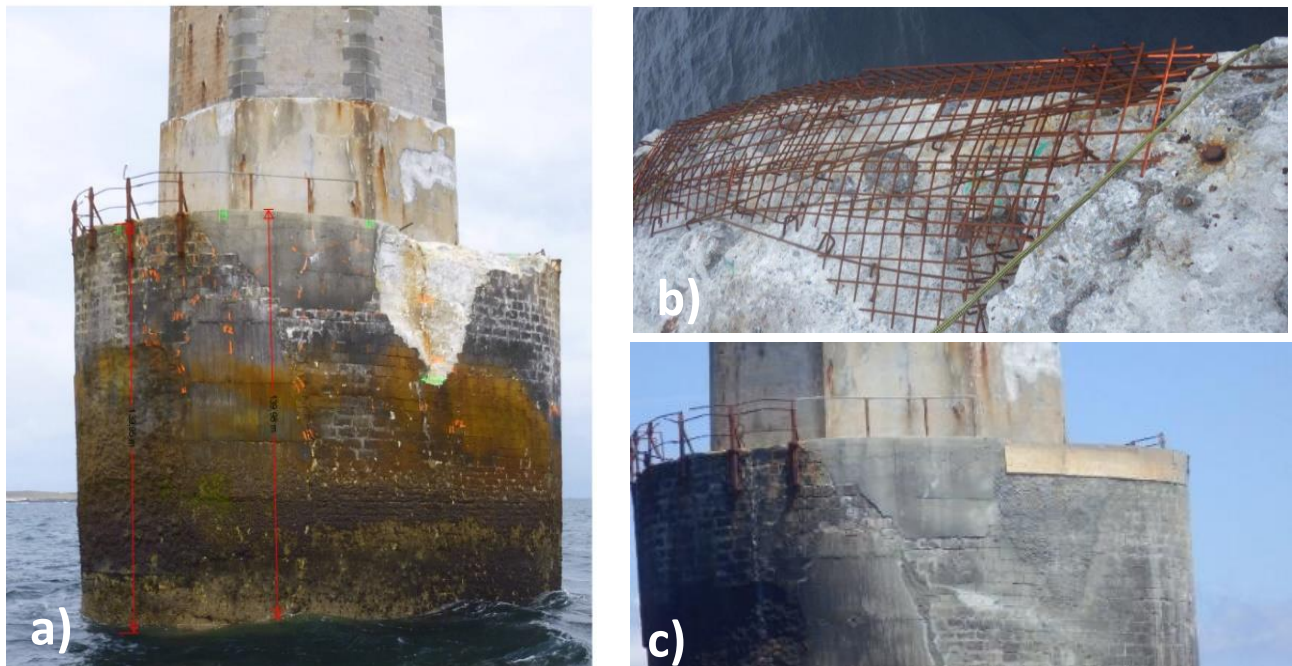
a) Concrete spalling after a severe storm in 2014[32]; b) & c) Shotcrete applied for reinforcement. [33]
